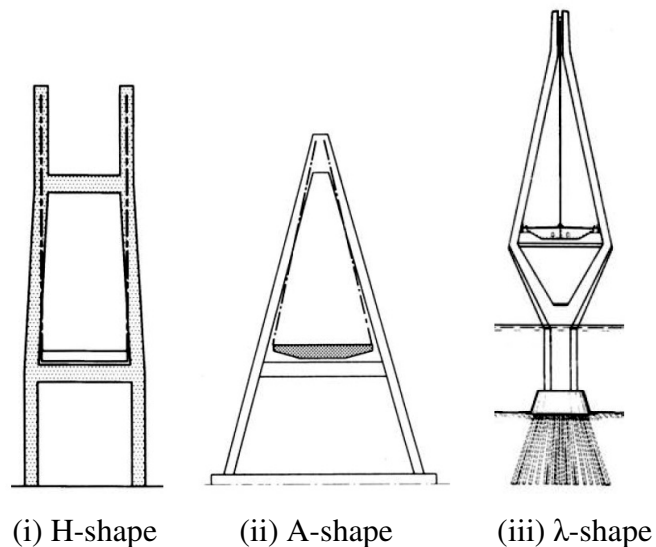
Bridge tower configurations (Gimsing, 1998)
